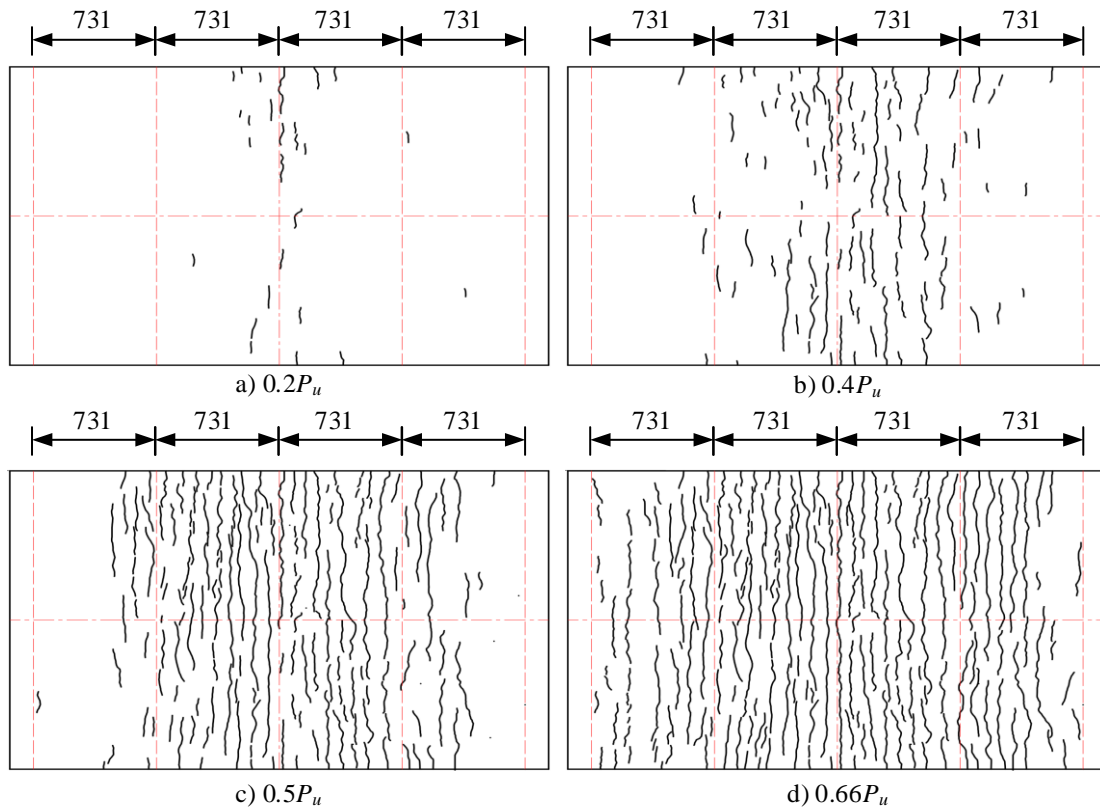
Cracking development of specimen GCN (Unit: mm)
